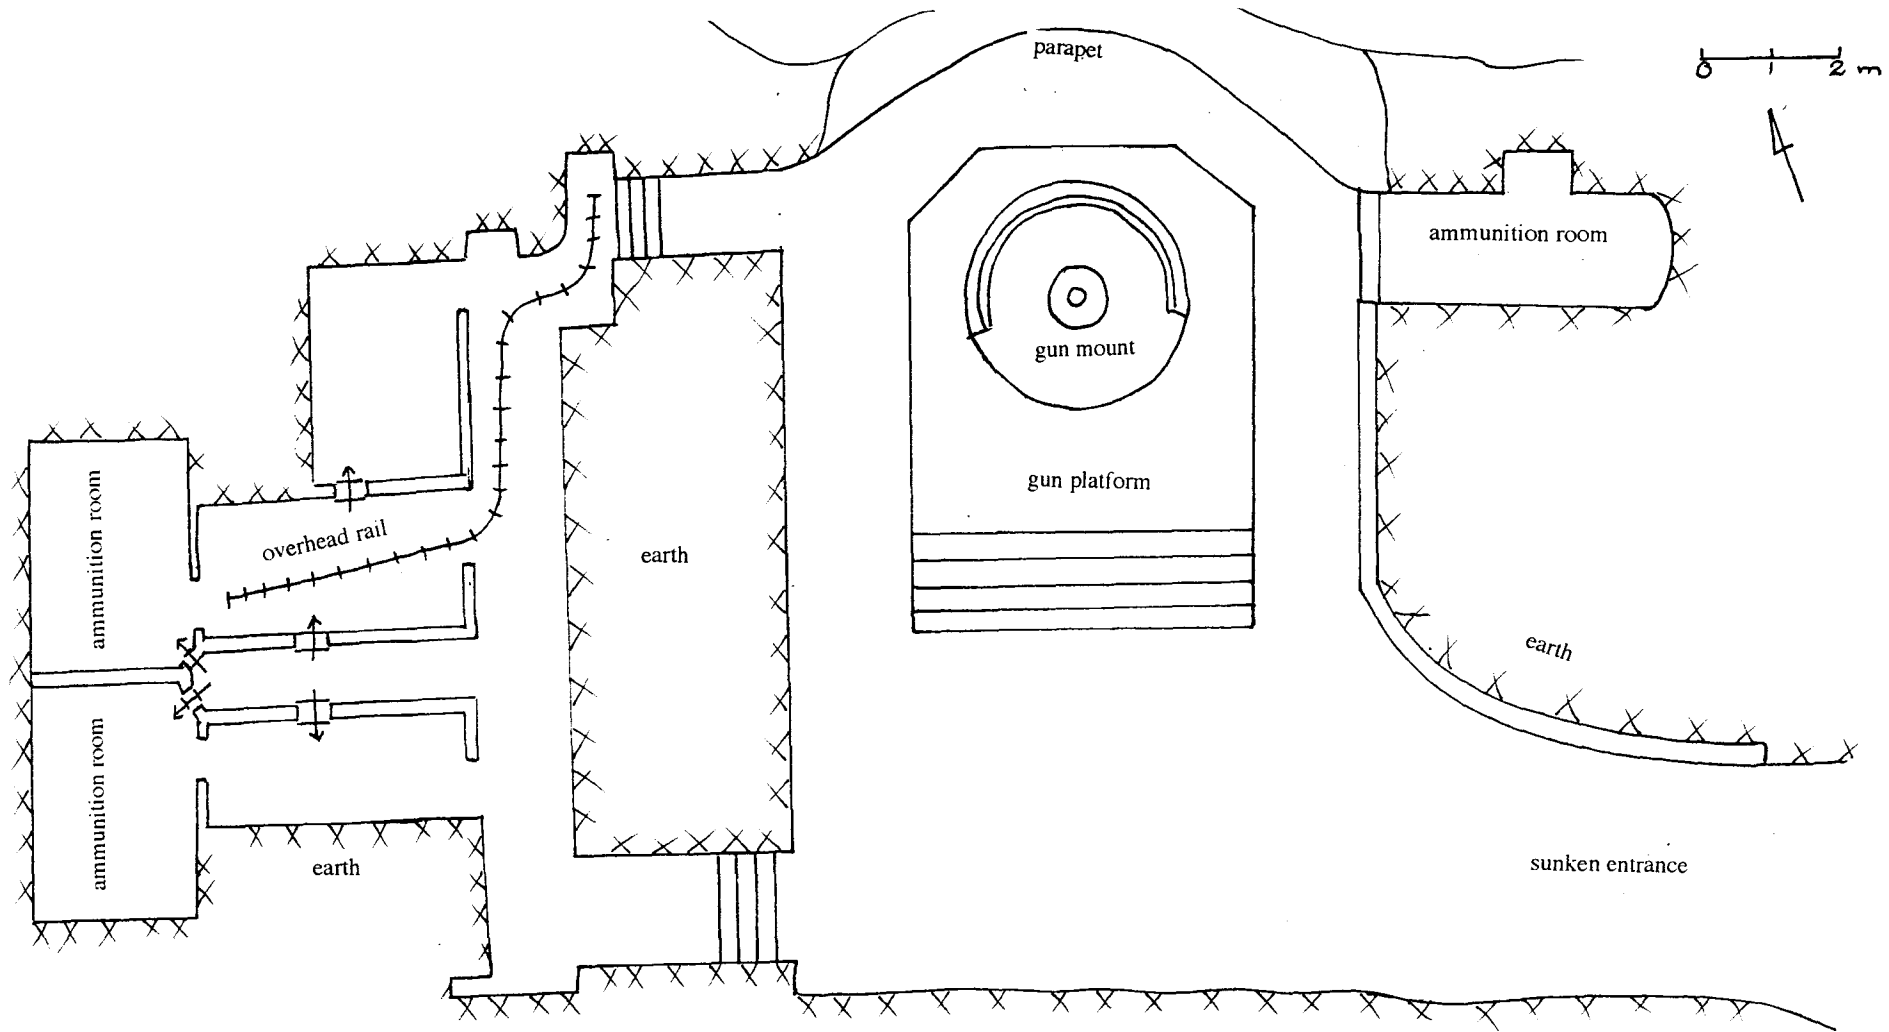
Plan of the Saddle Battery showing the gun platform and underground rooms for ammunition. A central corridor between the ammunition rooms has four small viewing hatches.
